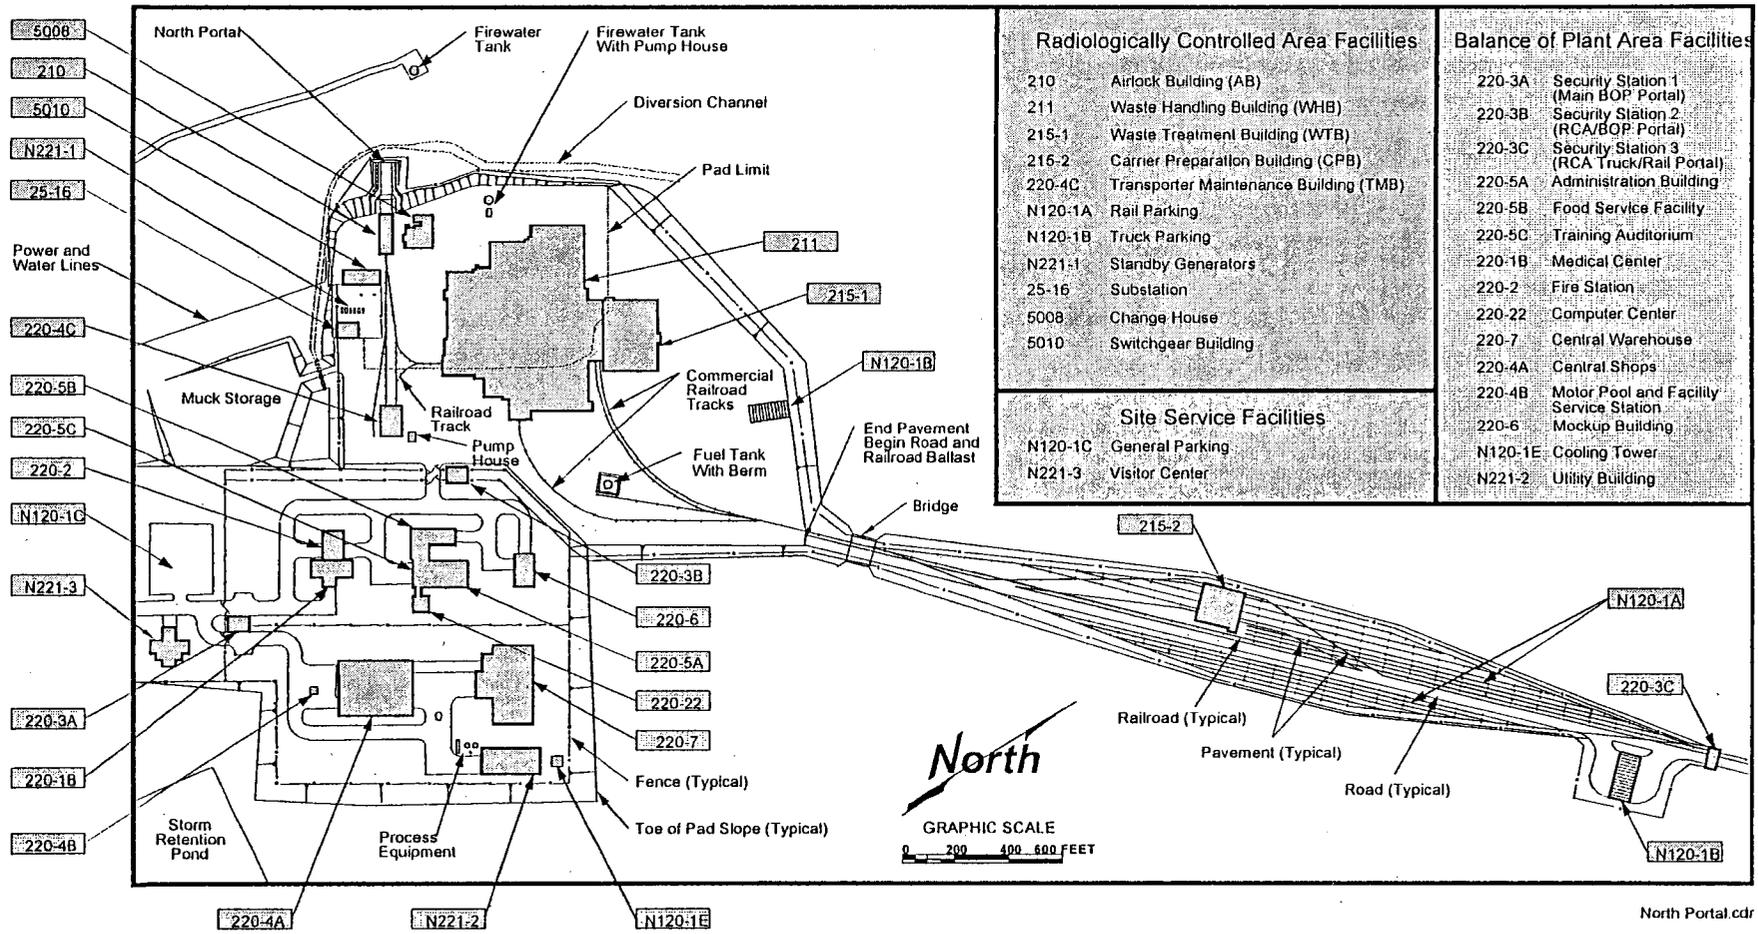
North Portal Repository Area Site Plan Above Ground
